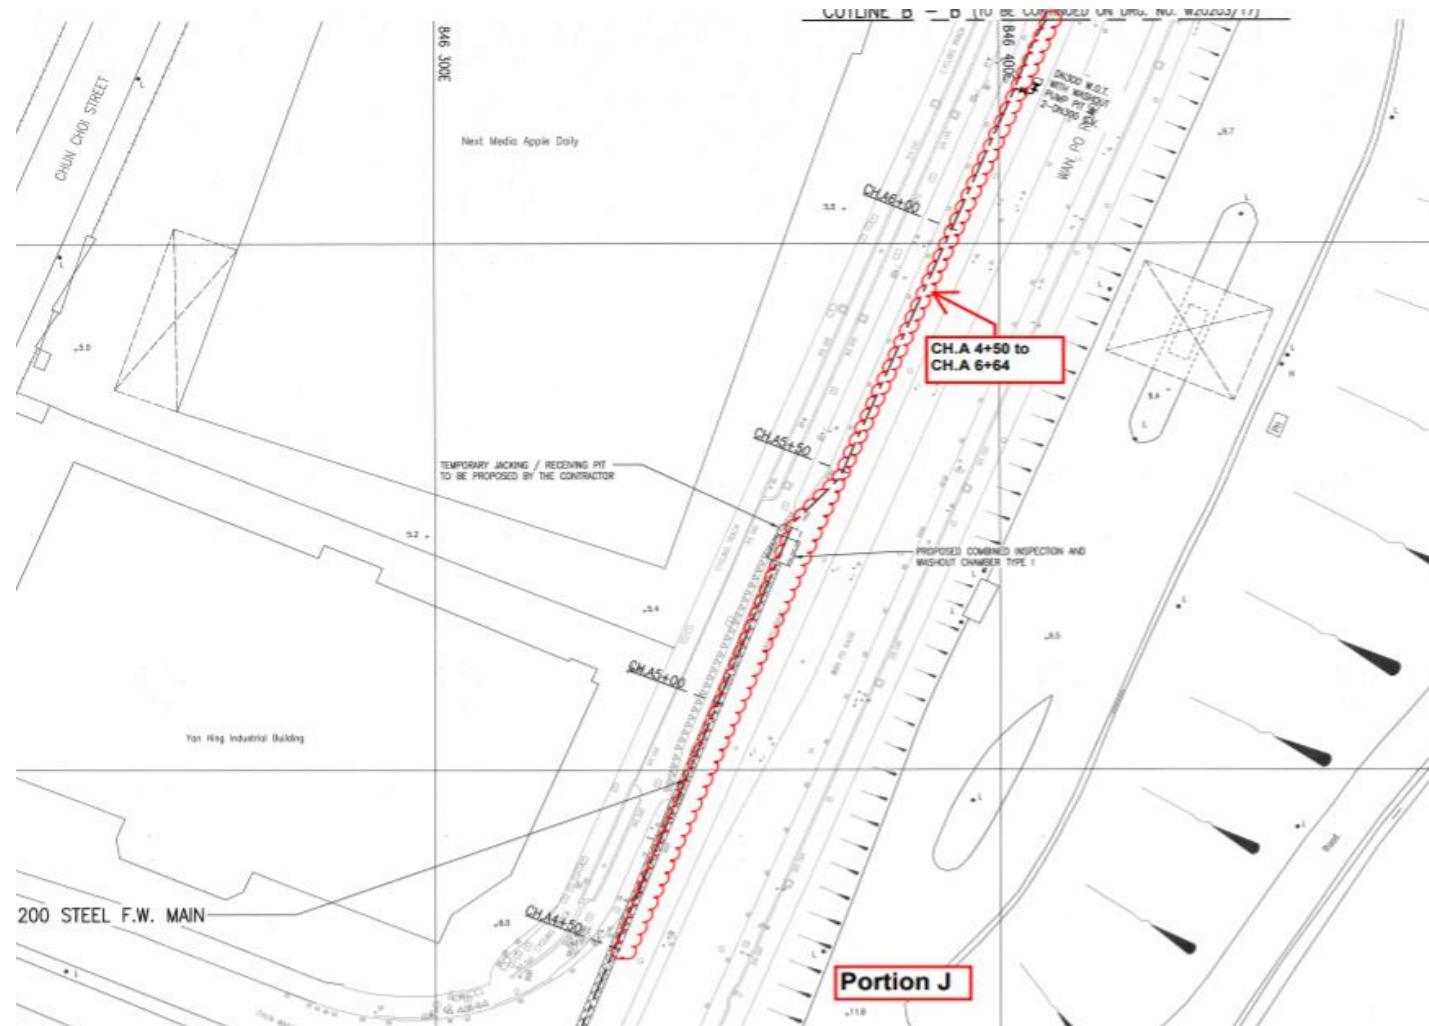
Location Plan for Portion J - CH.A 4+50 to CH.A 6+64
